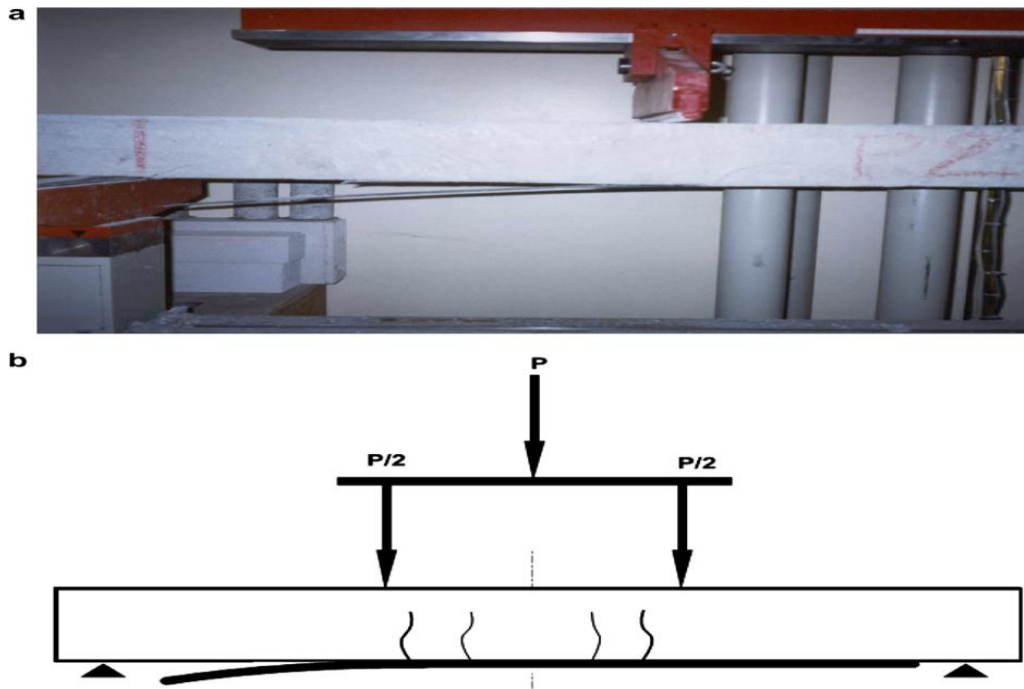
A repaired beam failure by interfacial debonding and (b) schematic drawing
